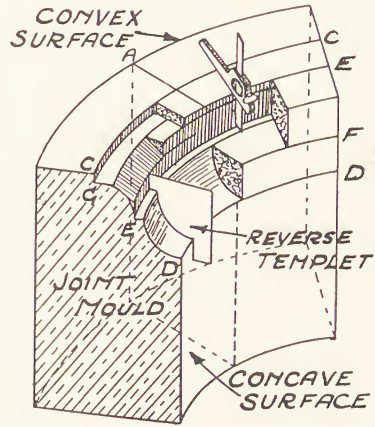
WORKING CIRCULAR MOULDINGS.
